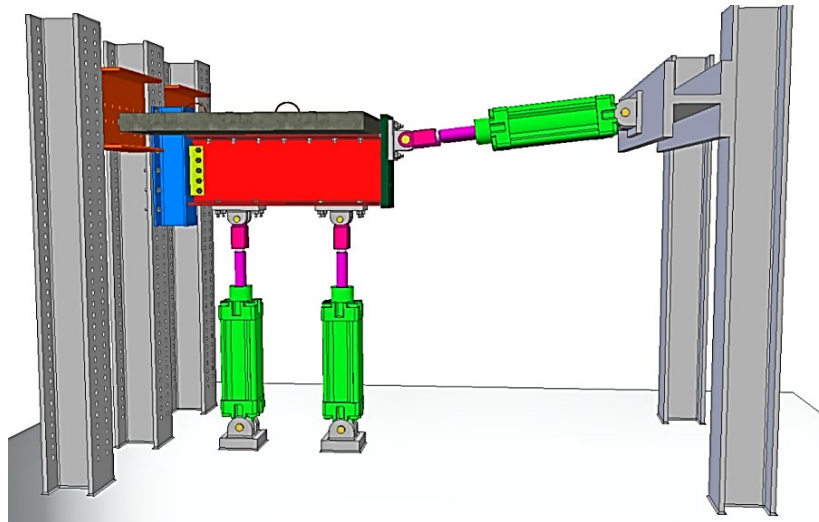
Elevation of Test Set-up for: (a) Pilot Test, ST36A, and ST36B;
